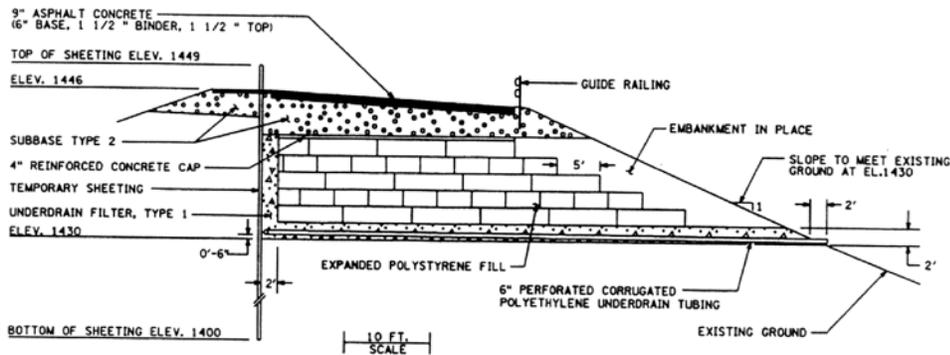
Profile of EPS-block geoforembankment (Jutkofsky 1998).
